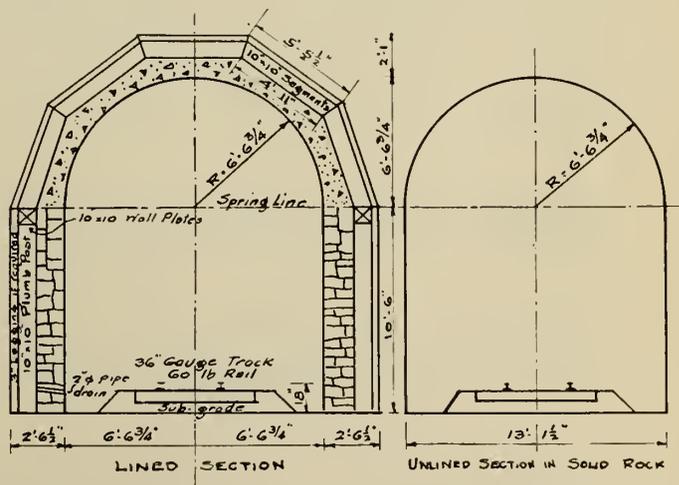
Tunnel Sections without Line of Timber Sets used in Soft Ground for Concrete.
